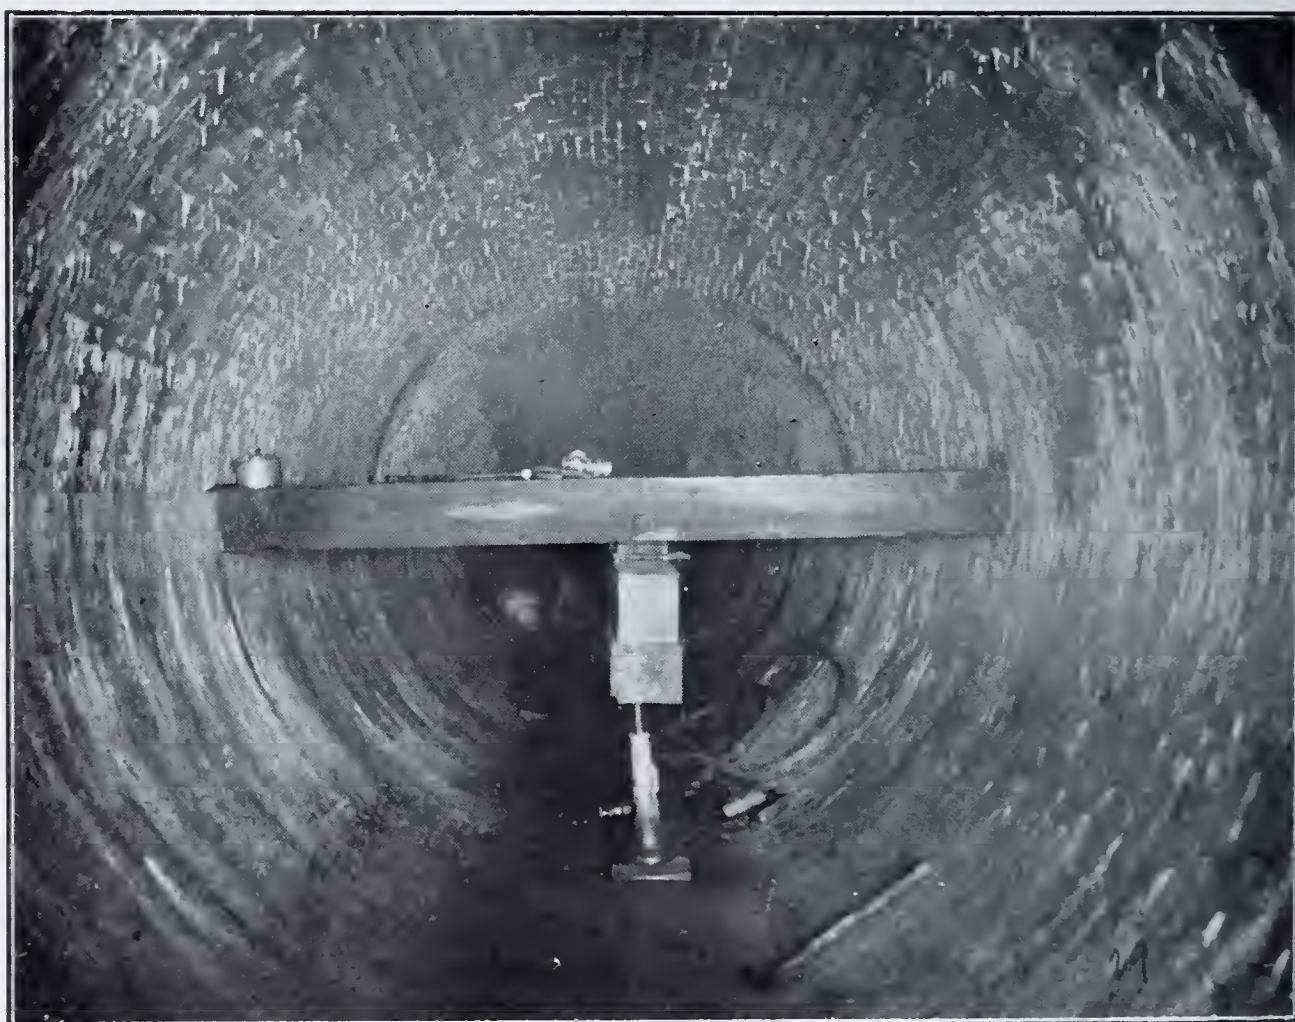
PLATE XX.—CLOSING WEEPER IN INVERT, SHAFT NO. 3.
